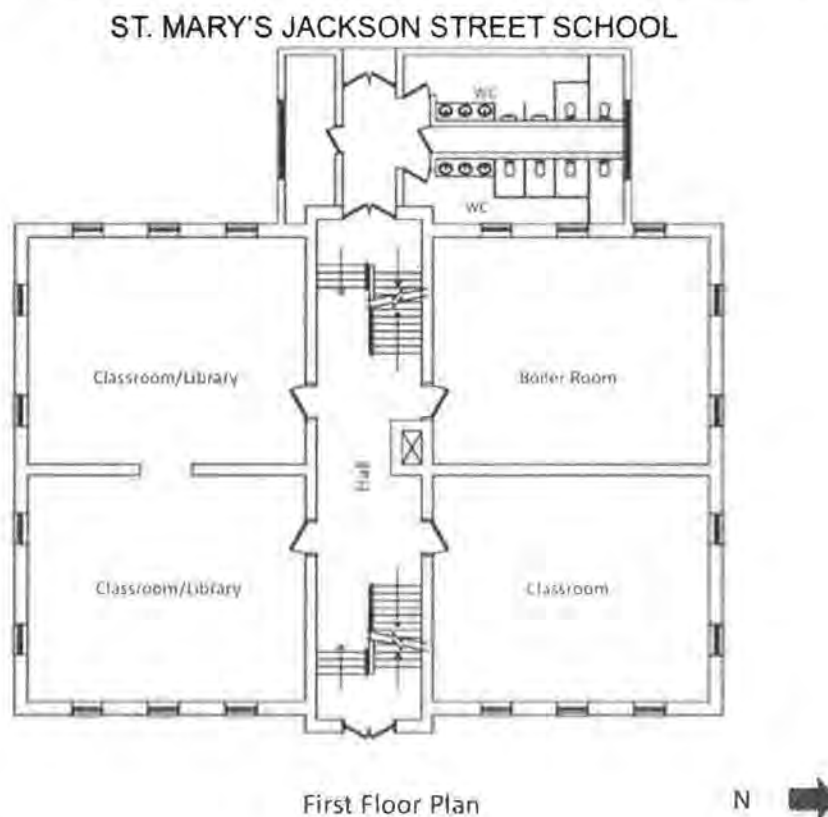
St. Mary's Jackson Street School First Floor Plan - January 2012.¹⁶
